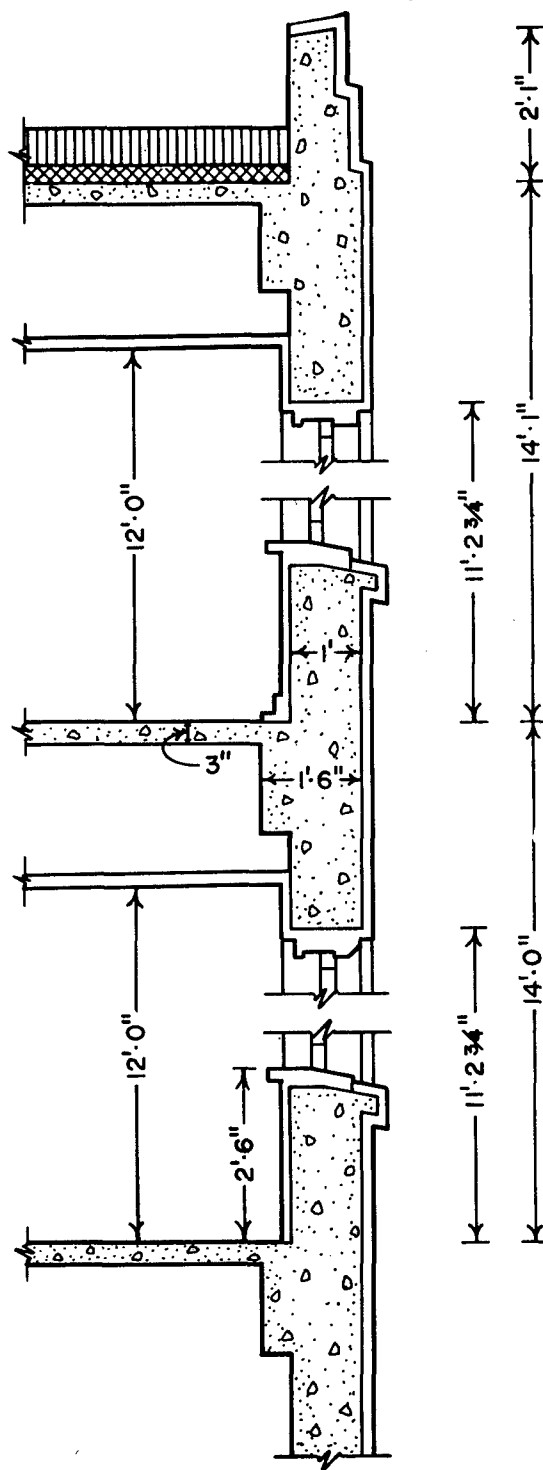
Typical wall section of North Hollywood High School classroom structure.
